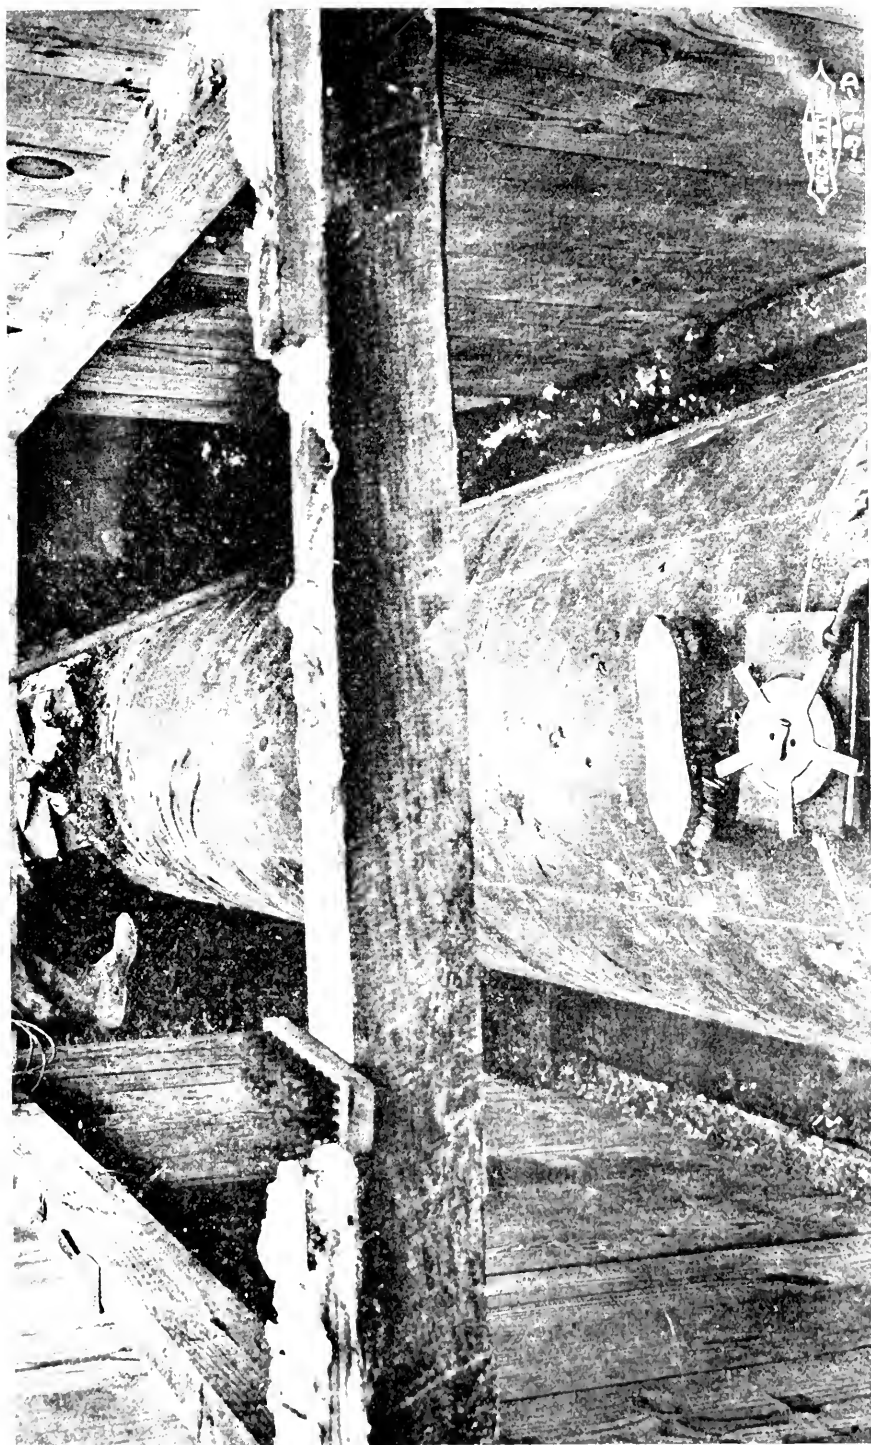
PLATE III. PHOTOGRAPH OF CORRODED STEEL. PIER VI STATION 140.
